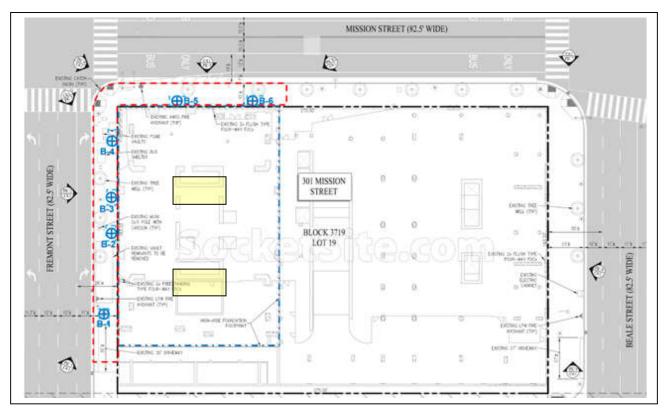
Drawing with highlighted reinforced-concrete shear wall systems that form the boundary of the center glass façade, shown on the reference map extract from the plan to fix the Millennium Tower, article dated March 12, 2019; downloaded from www.socketsite.com,
